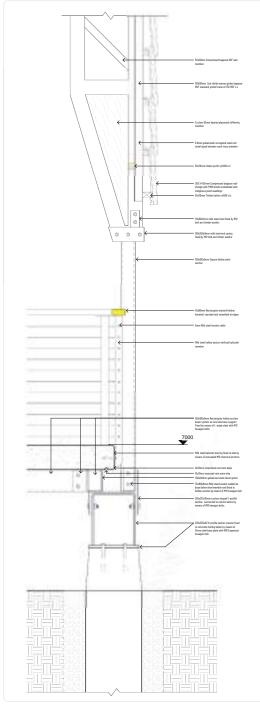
Detail Section Callout: 02 (Author, 2019)
